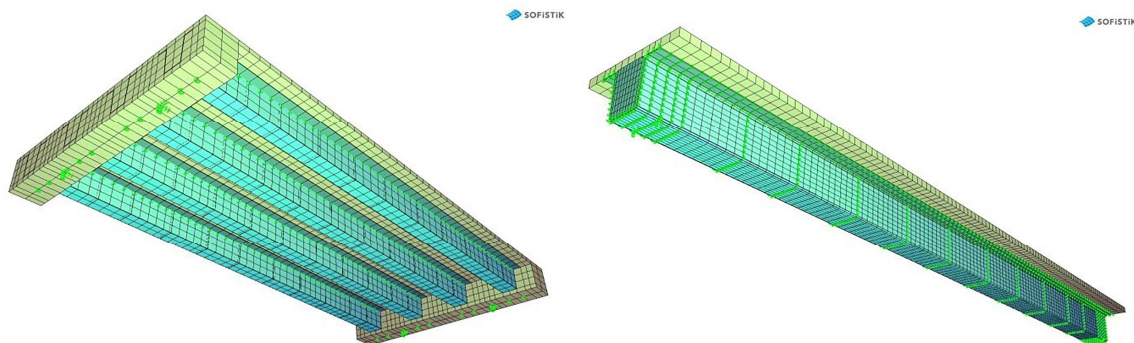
Numerical models of the bridge superstructure (upper) and the girder (lower)
